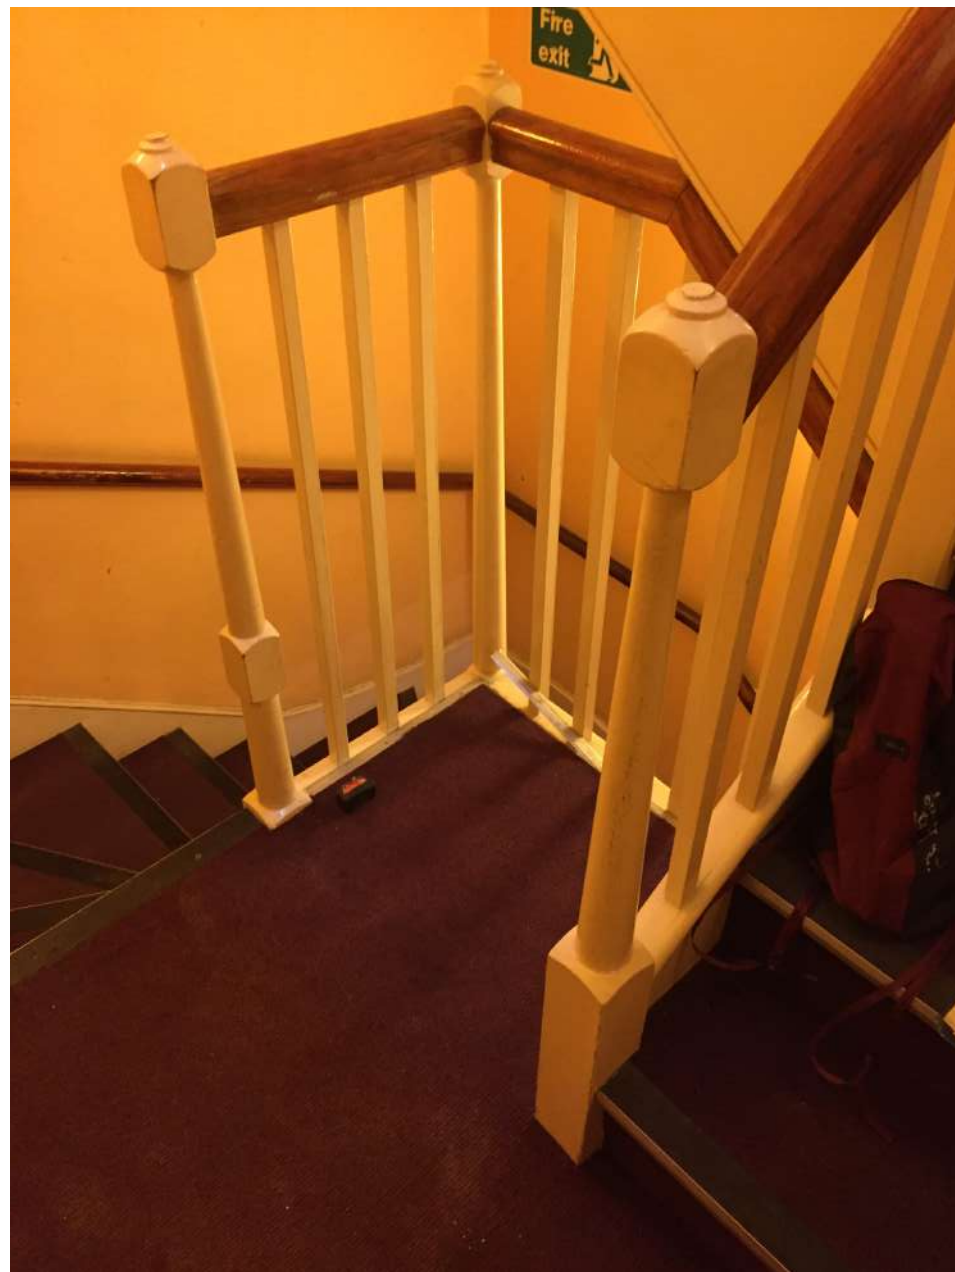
Existing Staircase and balustrading- note this not original but is to be retained and are included here for reference only. The stairs and balustrading all date from the 1988 conversion and have approval.
